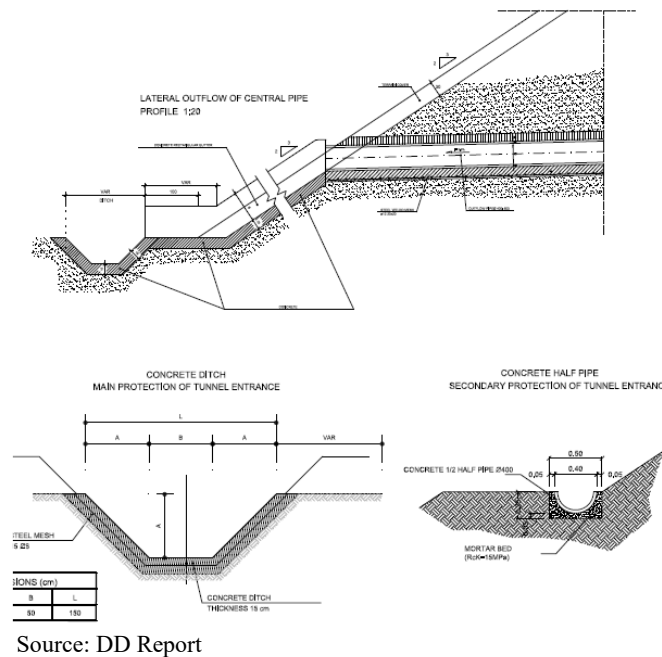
Transverse Drainage, Side Ditch and Drainage of Step of the Slope
